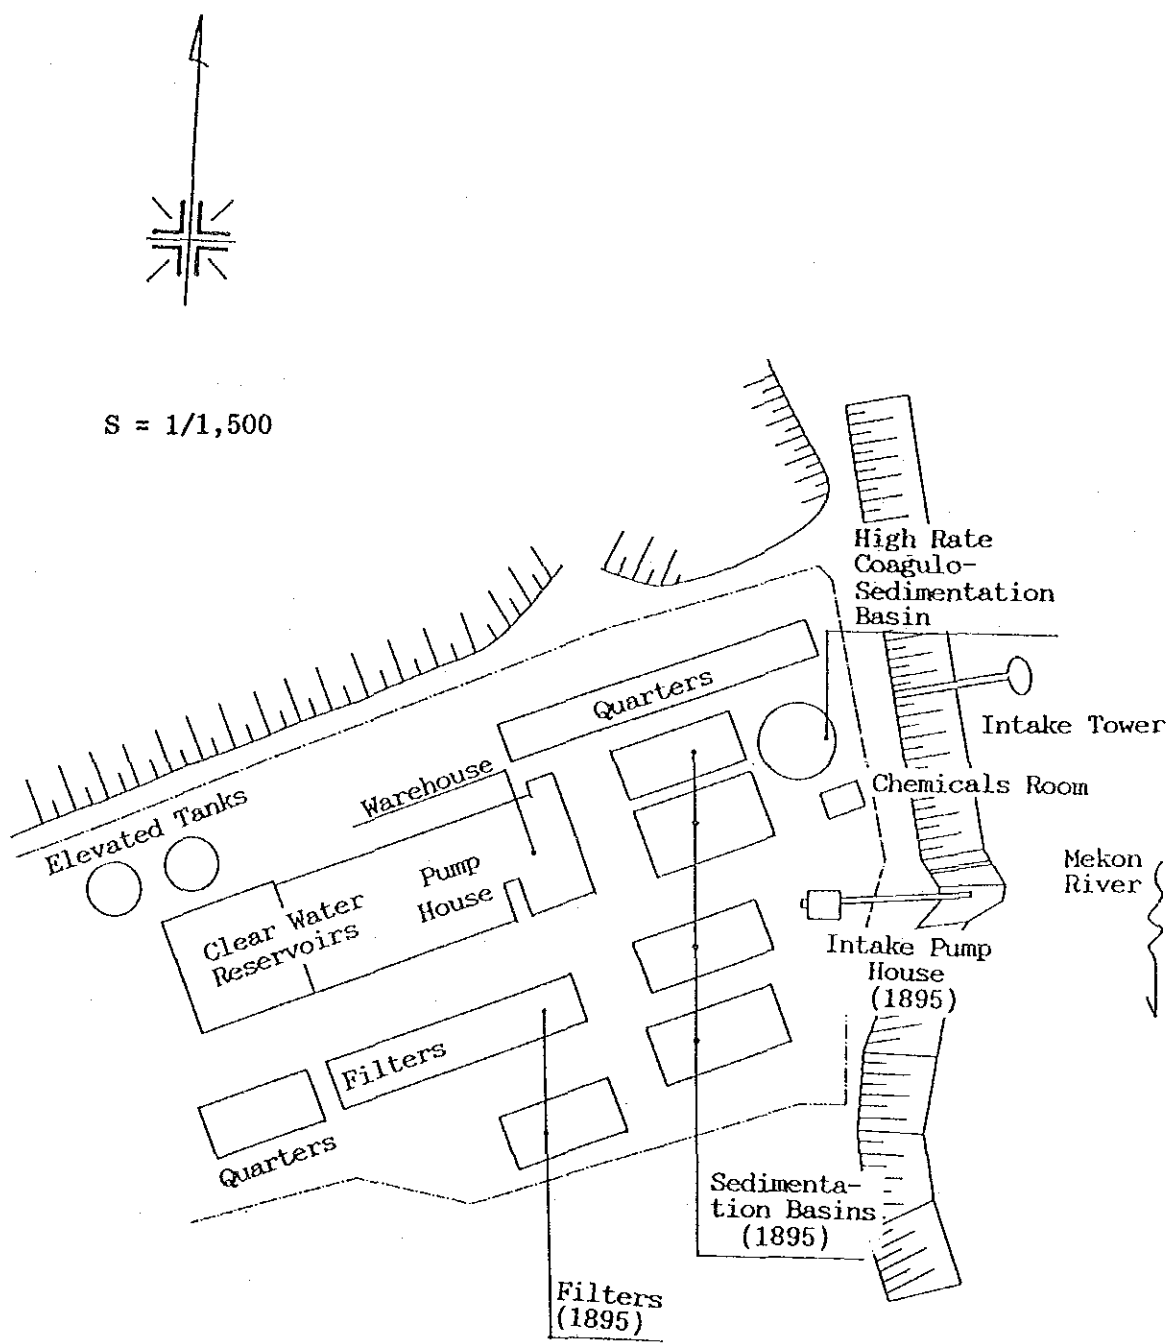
GENERAL PLAN OF CHROUY CHANGWAR TREATMENT PLANT
